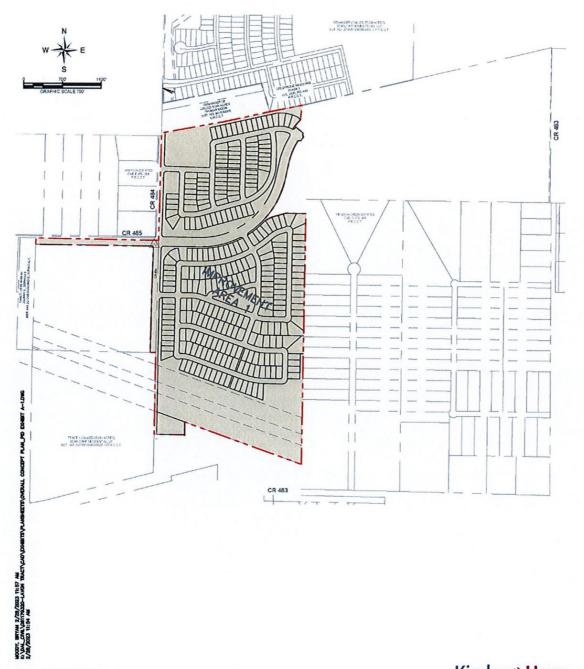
Improvement Area 1 Concept Plan Trails of Lavon Lavon, Collin County, Texas February 2023
